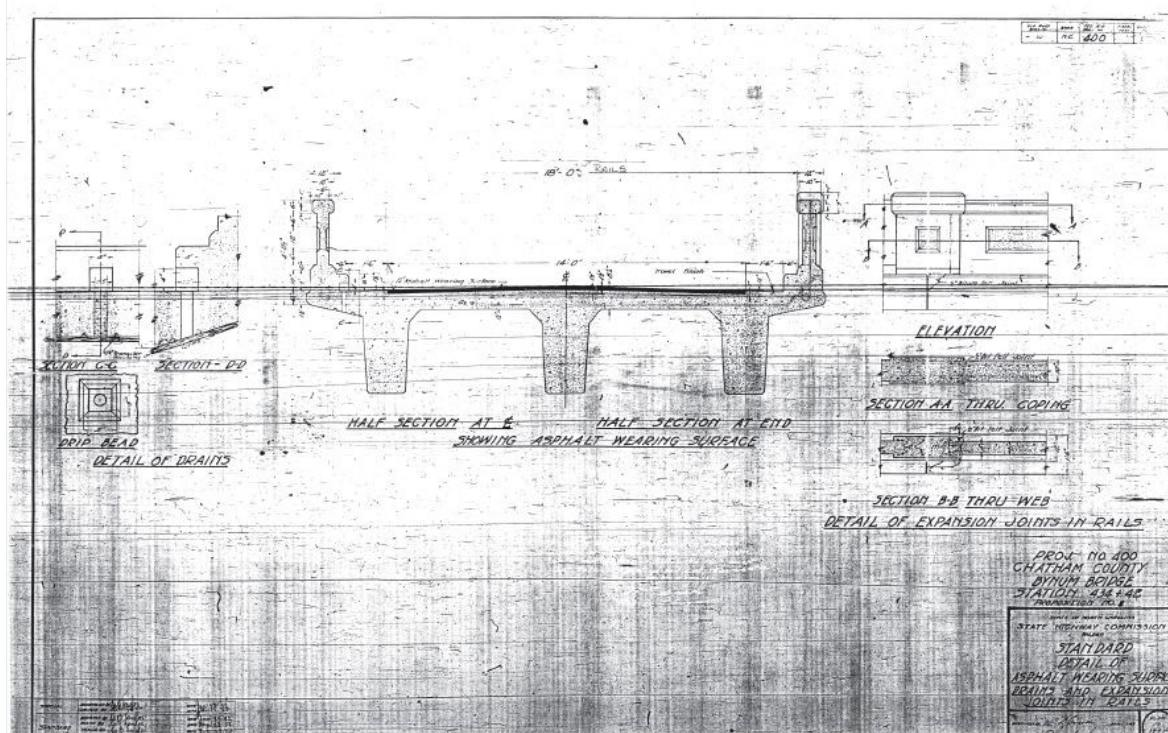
Drawing in section of longitudinal beams and deck of Bynum Bridge, N.C. State Highway Commission, ca. 1922
